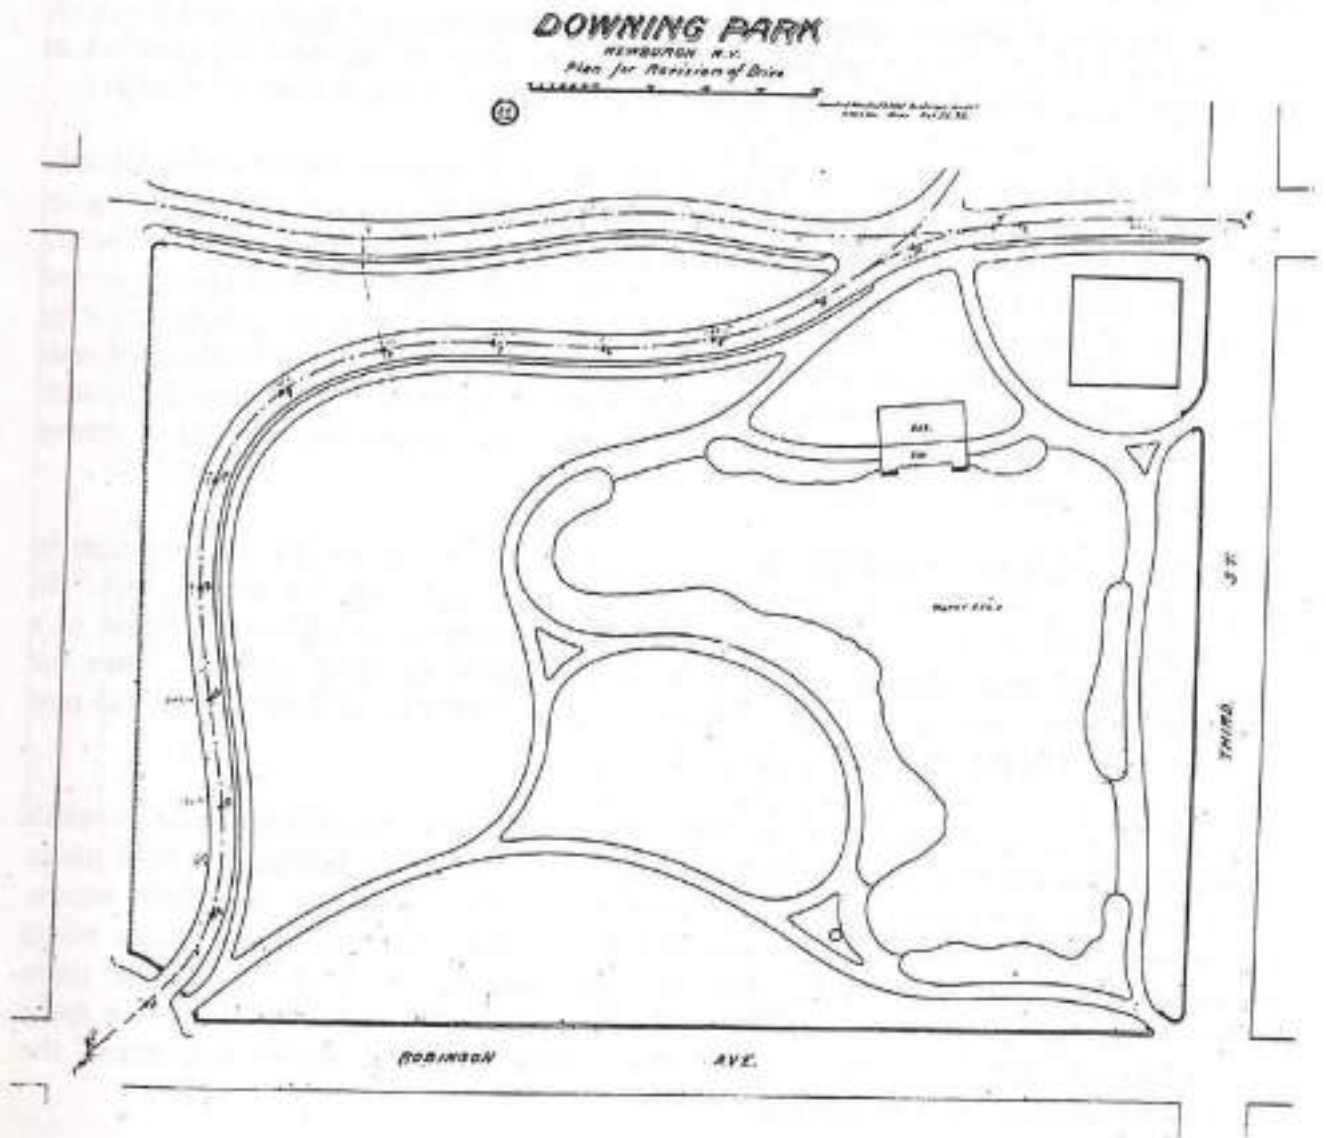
Downing Park, Plan for Revision of the Drive, No. 20, showing the lower portion of Downing Park with Carpenter Avenue, the internal drive, walks and pond, Olmsted Olmsted & Eliot, October, 22, 1895. FLONHS
